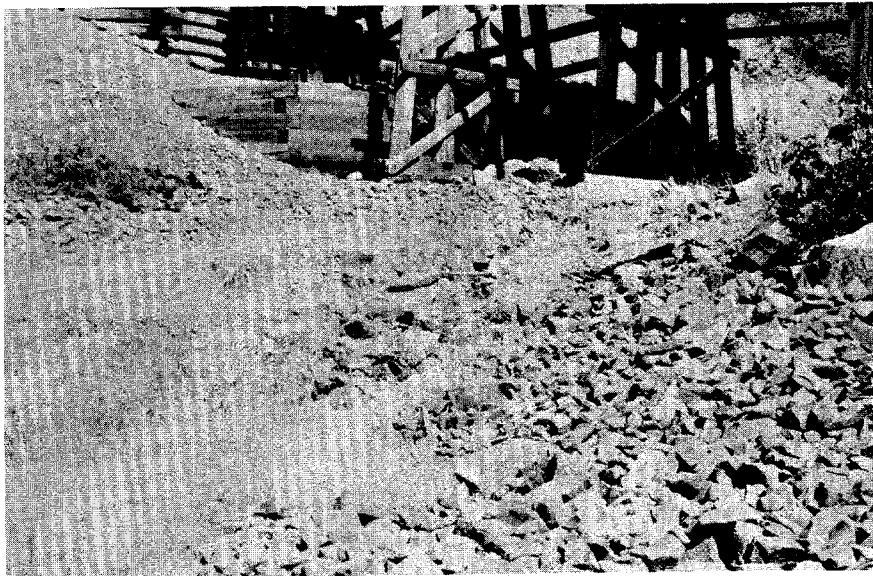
Streambed material between gabion retaining wall and railroad trestle in 1977. Note growth of vegetation in streambed.
